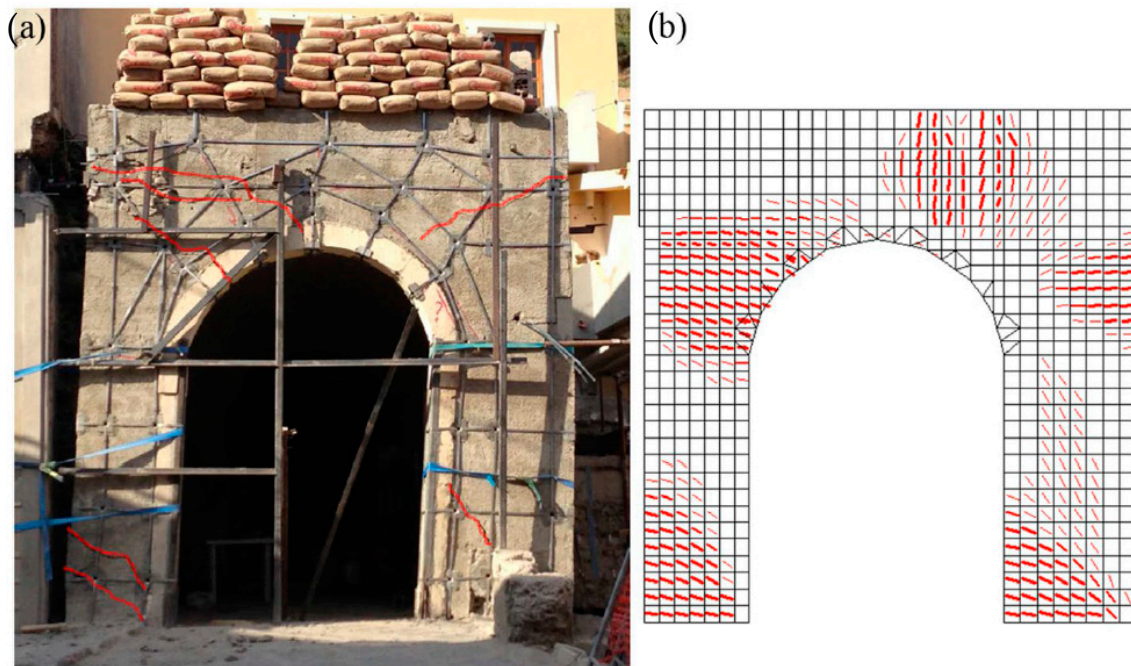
(a) Experimental and (b) numerical crack patterns for the RM wall.
